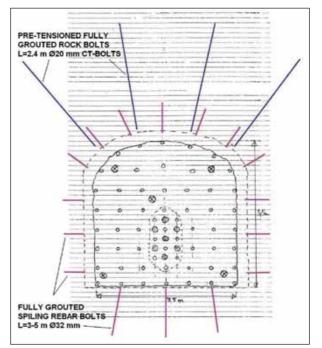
Installed permanent rock support for underwater piercing blast round. (Illustration: Dyno Nobel / Norconsult)
